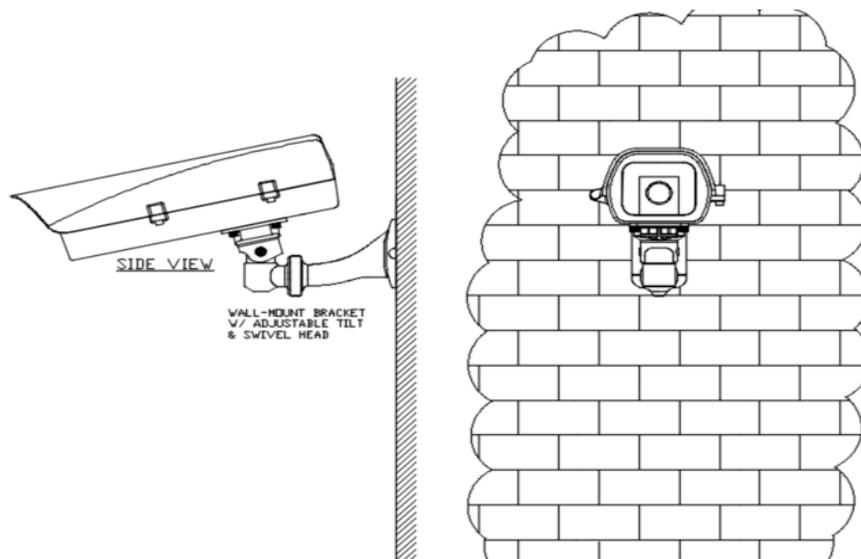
TYPICAL WALL MOUNT APPLICATION
